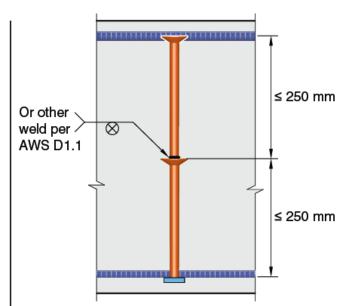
Stacking (piggybacking) of headed shear stud reinforcement.
